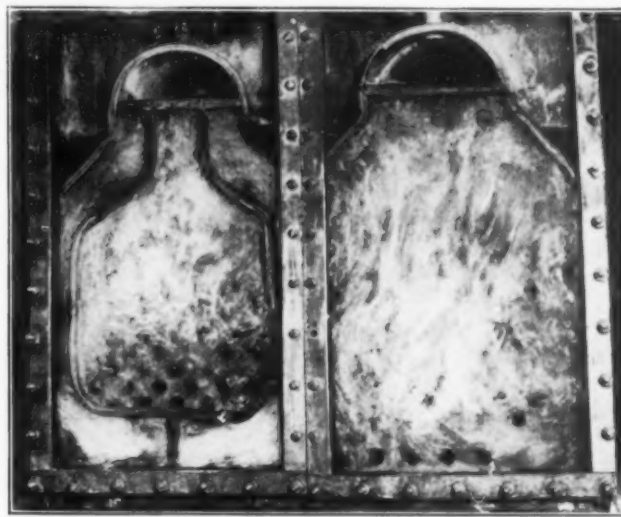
FRONT HEADERS; LOAD 500 PER CENT; SETTING AS IN FIG. 3a
